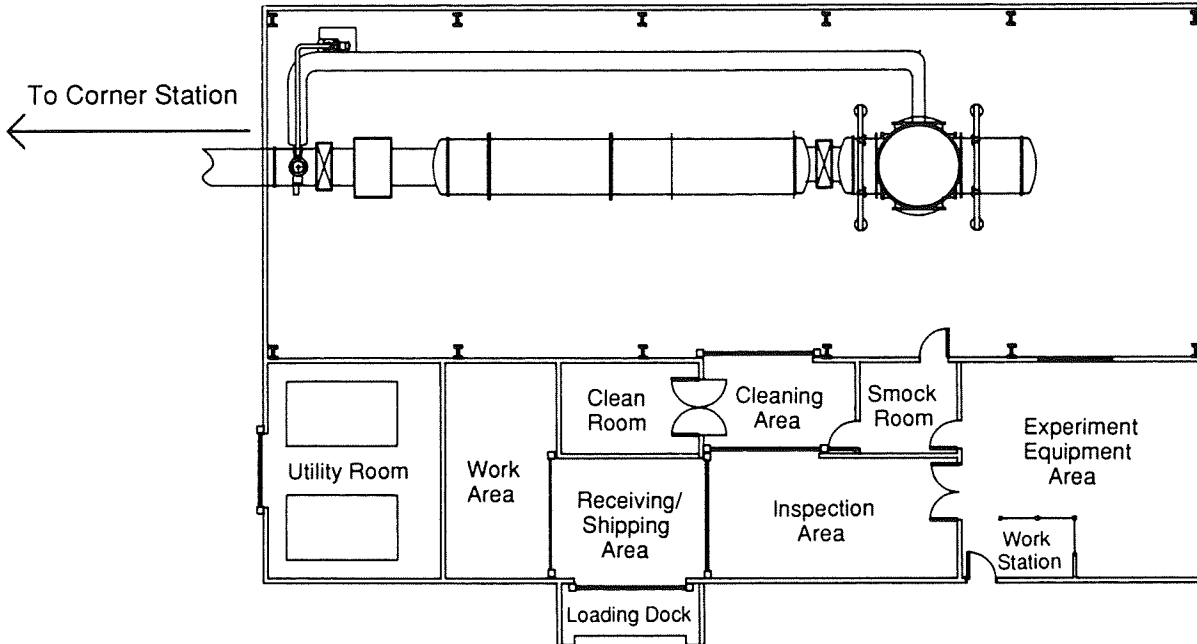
Floor plan of the right-arm end stations, common to both sites. The left-arm end stations have similar (mirror-imaged) floor plans.
